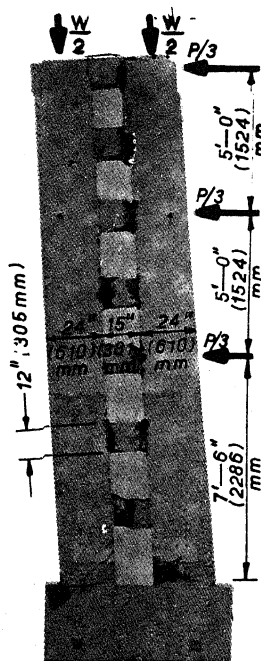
One Quarter Full Size Shear Wall Model with Conventionally Reinforced Coupling Beams which Failed in Sliding Shear.
